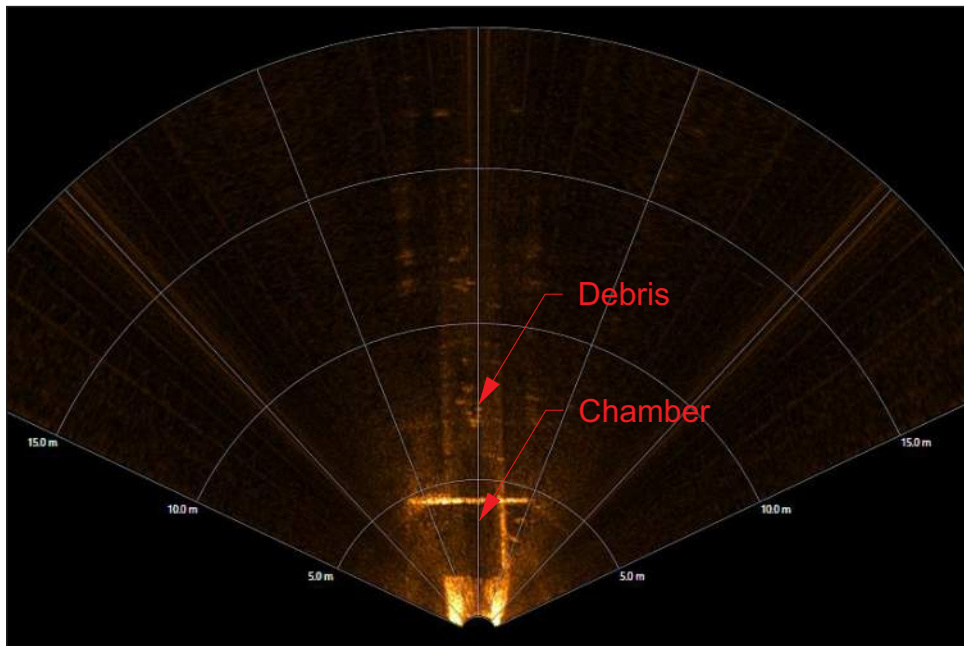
Sonar image at 36 feet downstream of Access Point 1. Manhole chamber visible and debris on invert 24 feet ahead.
